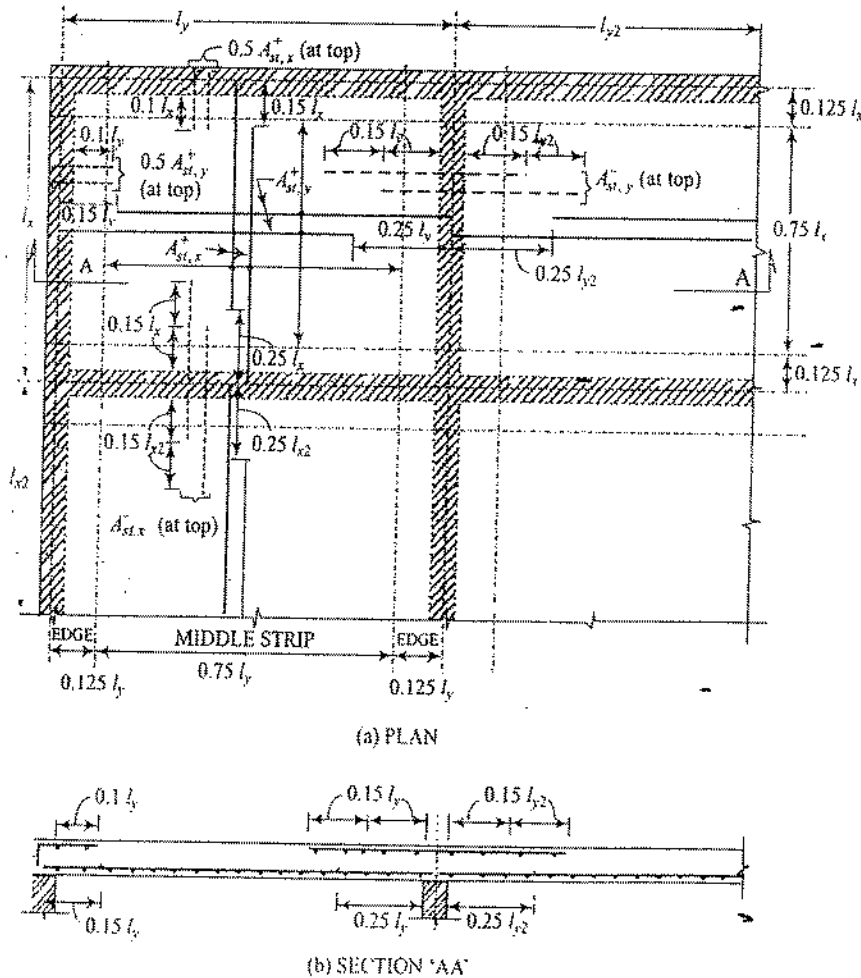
Detailing of flexural reinforcement in two-way 'restrained' rectangular slabs (excluding corner reinforcement).
